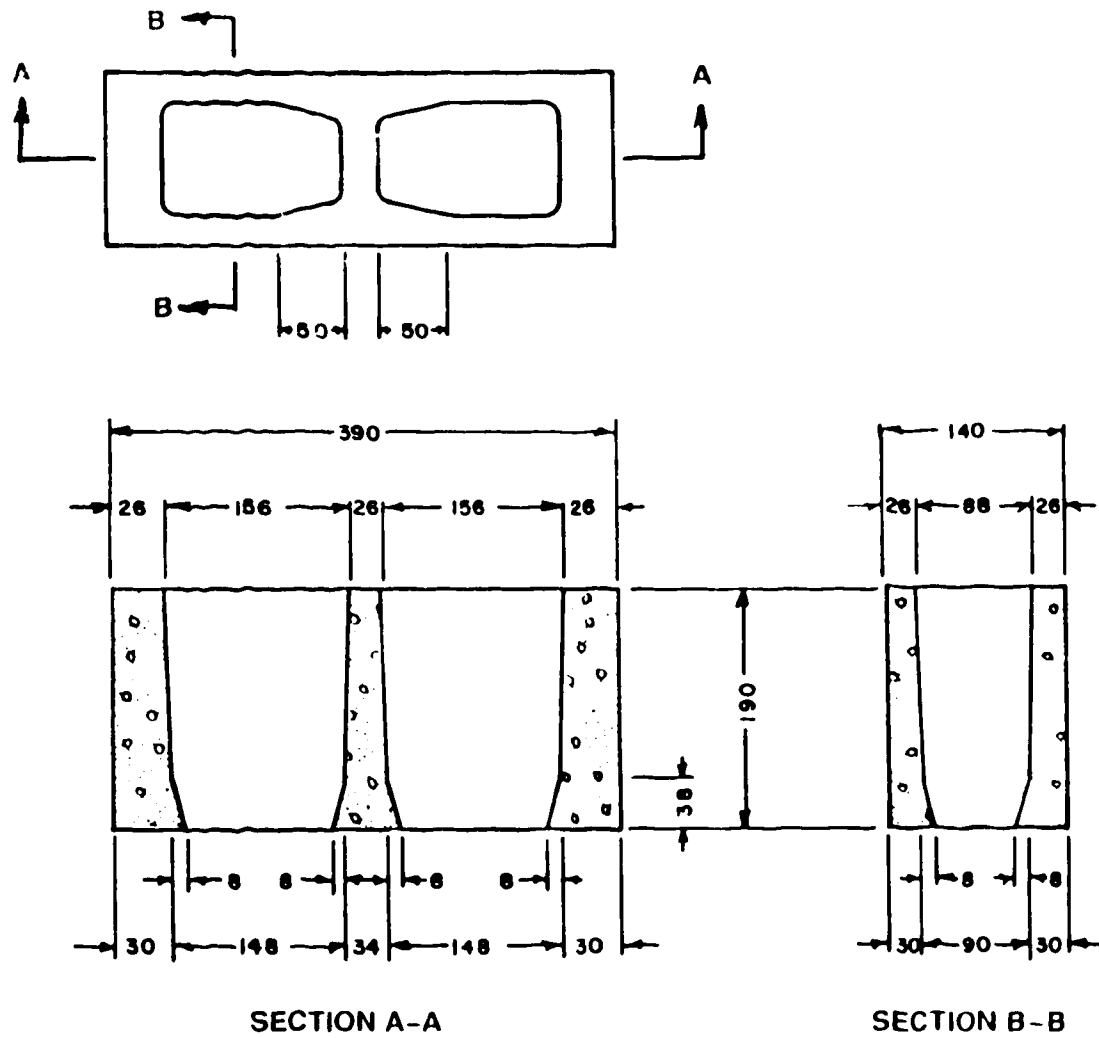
Concrete Block Unit Dimensions - 150 mm
